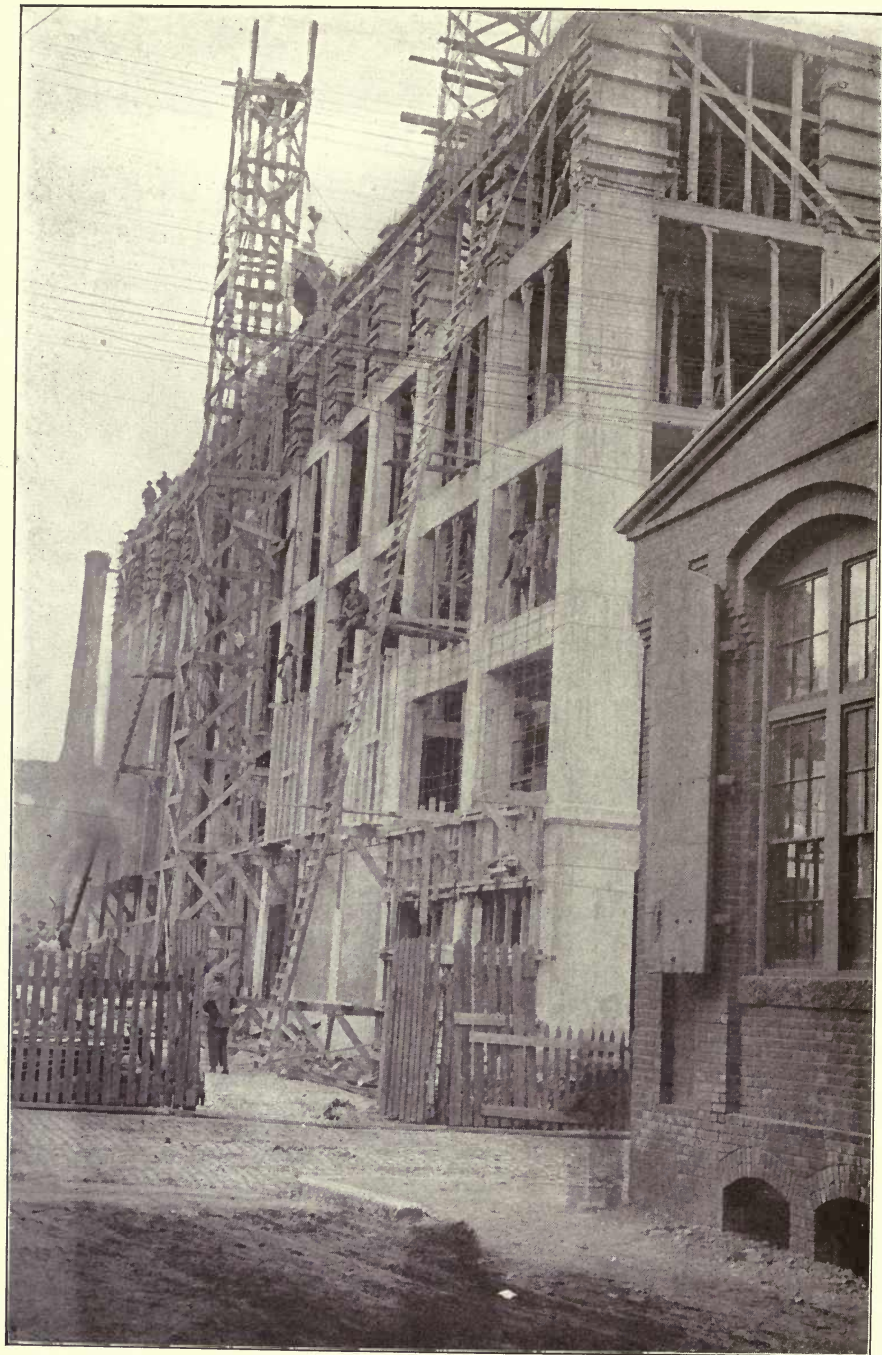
Lynn Storage Warehouse at Sixth Floor Level. (See p. 82.)
